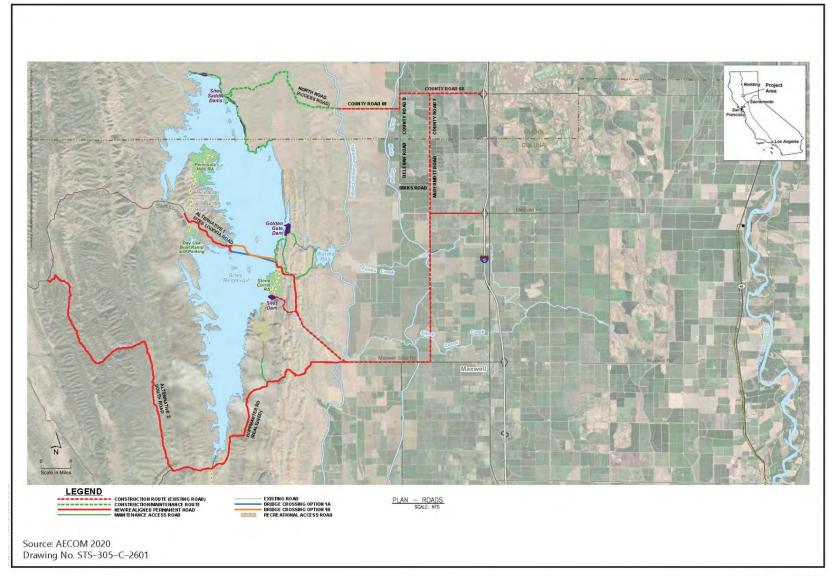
Local Access, Construction Access, and Maintenance Access Roads
